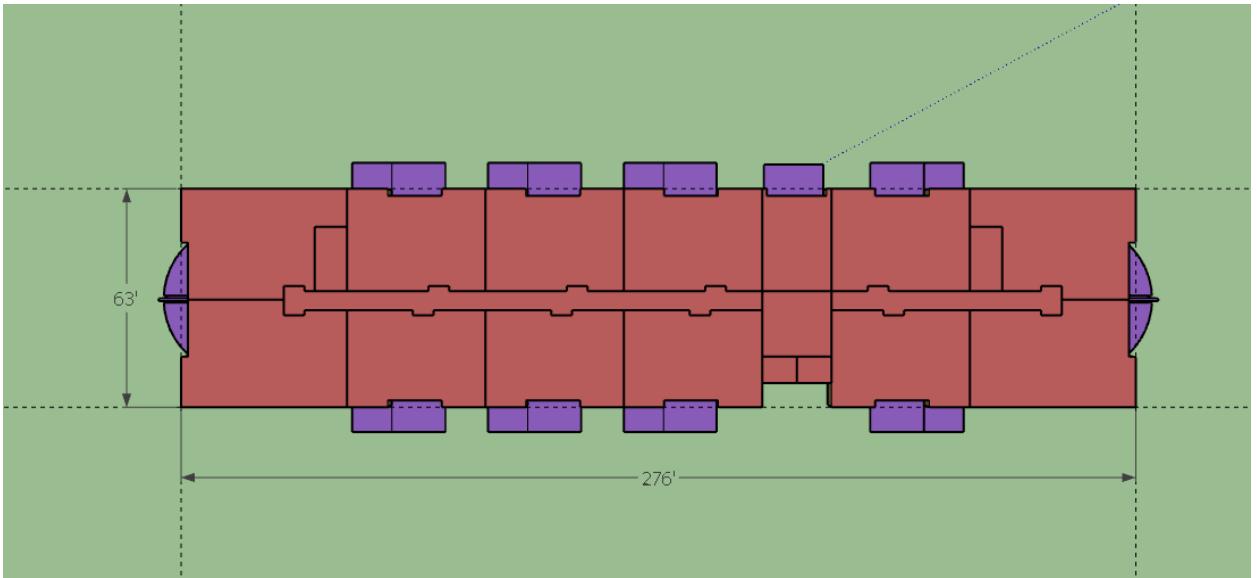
A two-dimensional rendering of the floor plan for the building's upper levels, using SketchUp Pro 2019 and OpenStudio
